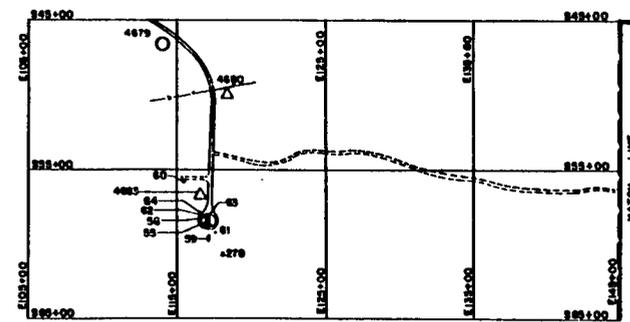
Structure Location Plan for TA-36 - Kappa Site (1983 Drawing from the LANL Technical Area Structure Location Plans)
